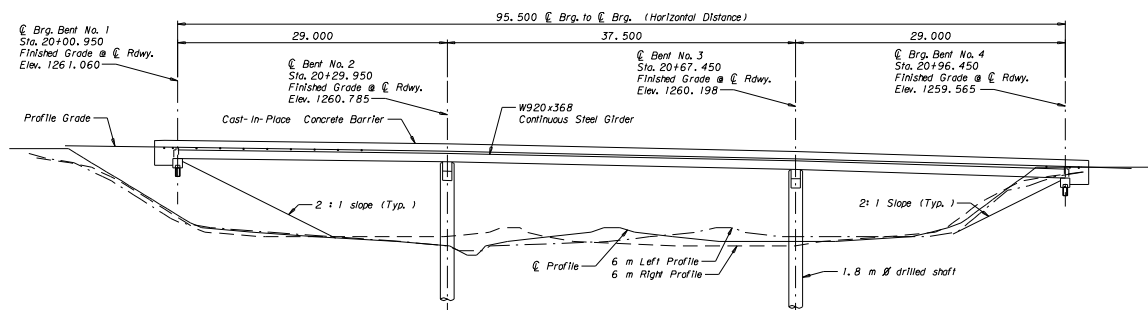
ELEVATION VIEW OF CASE STUDY BRIDGE
